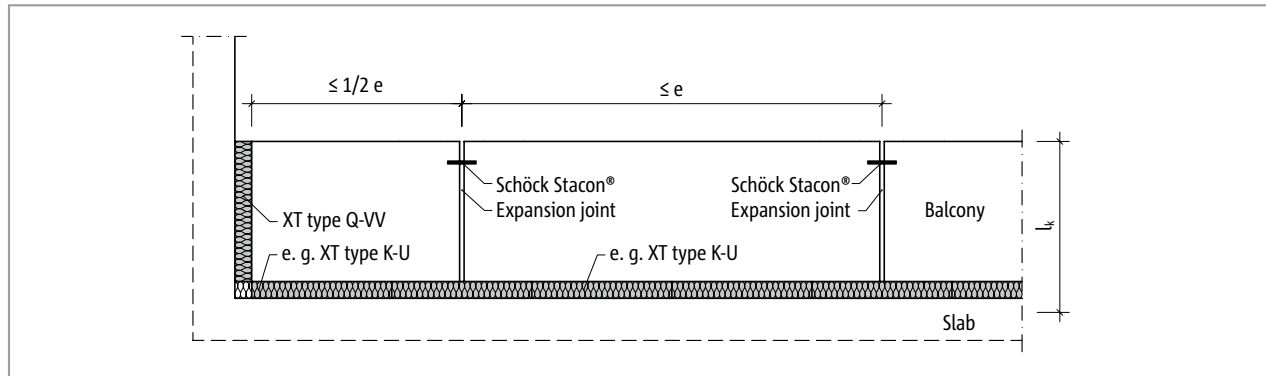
Schöck Isokorb® XT type K-U: Expansion joint configuration
